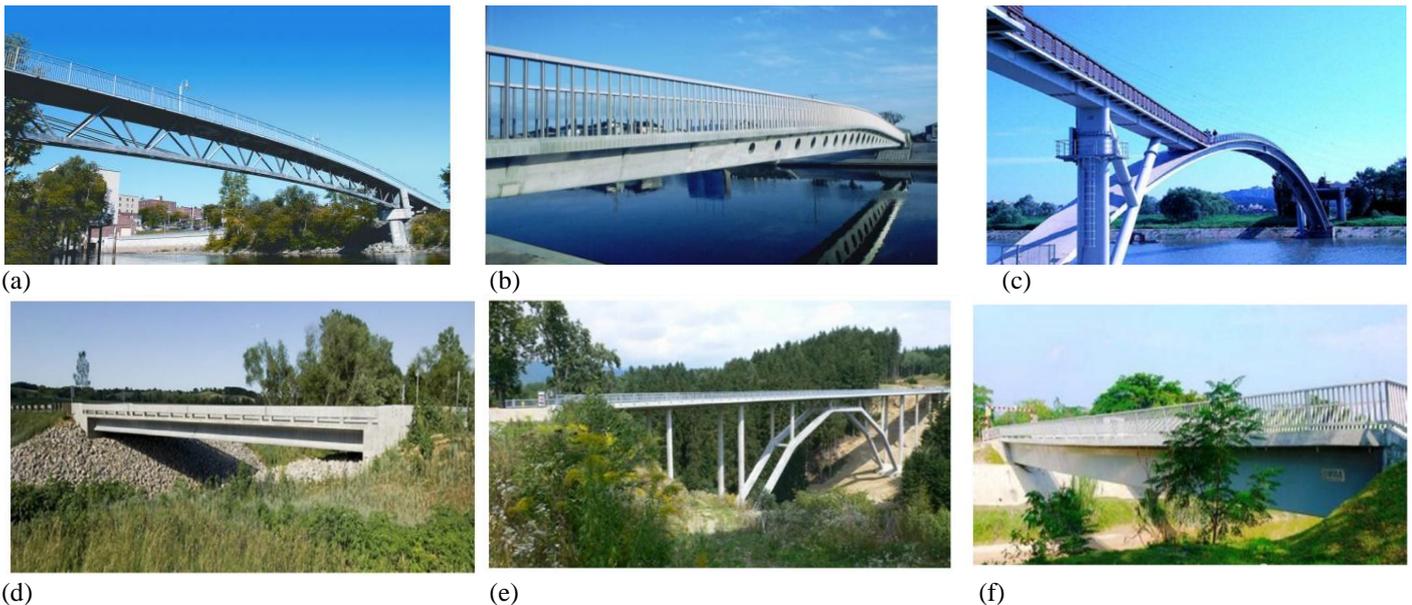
a) Pedestrian bridge, Sherbrooke, Quebec, Canada (Source: Lafarge); b) Sakata – Mirai footbridge (Tanaka et al. 2008); c) South Korea Peace Bridge (Source: www.seoul.go.kr.com); d) American Mars Hill Bridge. (Source: www.ductal.com); e) Wild Bridge (Source: Nguyen et al. 2015); f) KampungLinsum Bridge (Source: Vooet al.2012).
